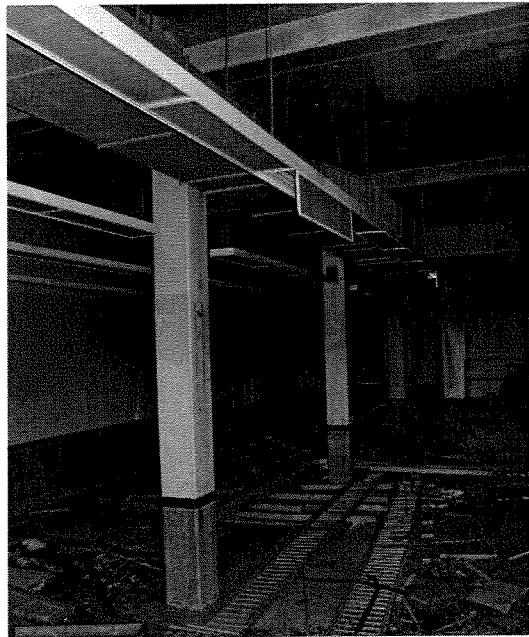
Terminal Equipment Room Test Stand No. 1 (Unit 123), Beta Test Complex, 1963-1964. Interior. Looking east. View of May 2005.
